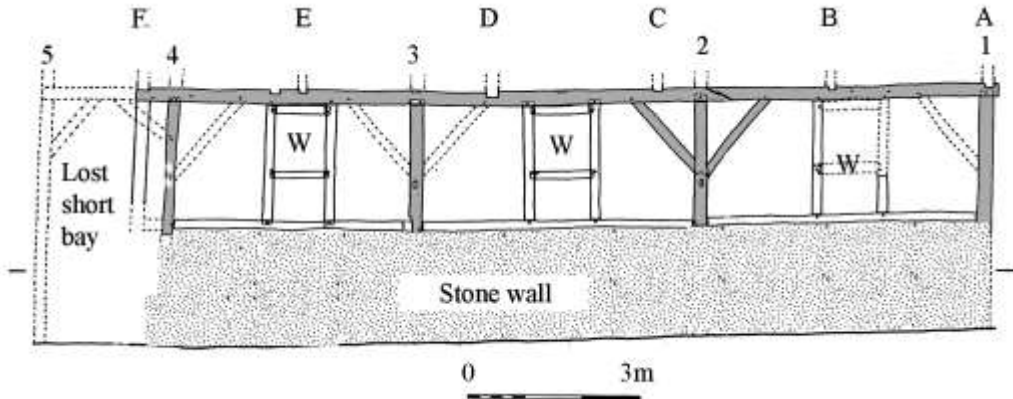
Internal elevation of the south wall of the barn showing the surviving hall timbers (shaded) and the window positions (W). The numbers (1–5) show the positions of the aisled hall trusses; the letters (A–F) show the present truss positions
